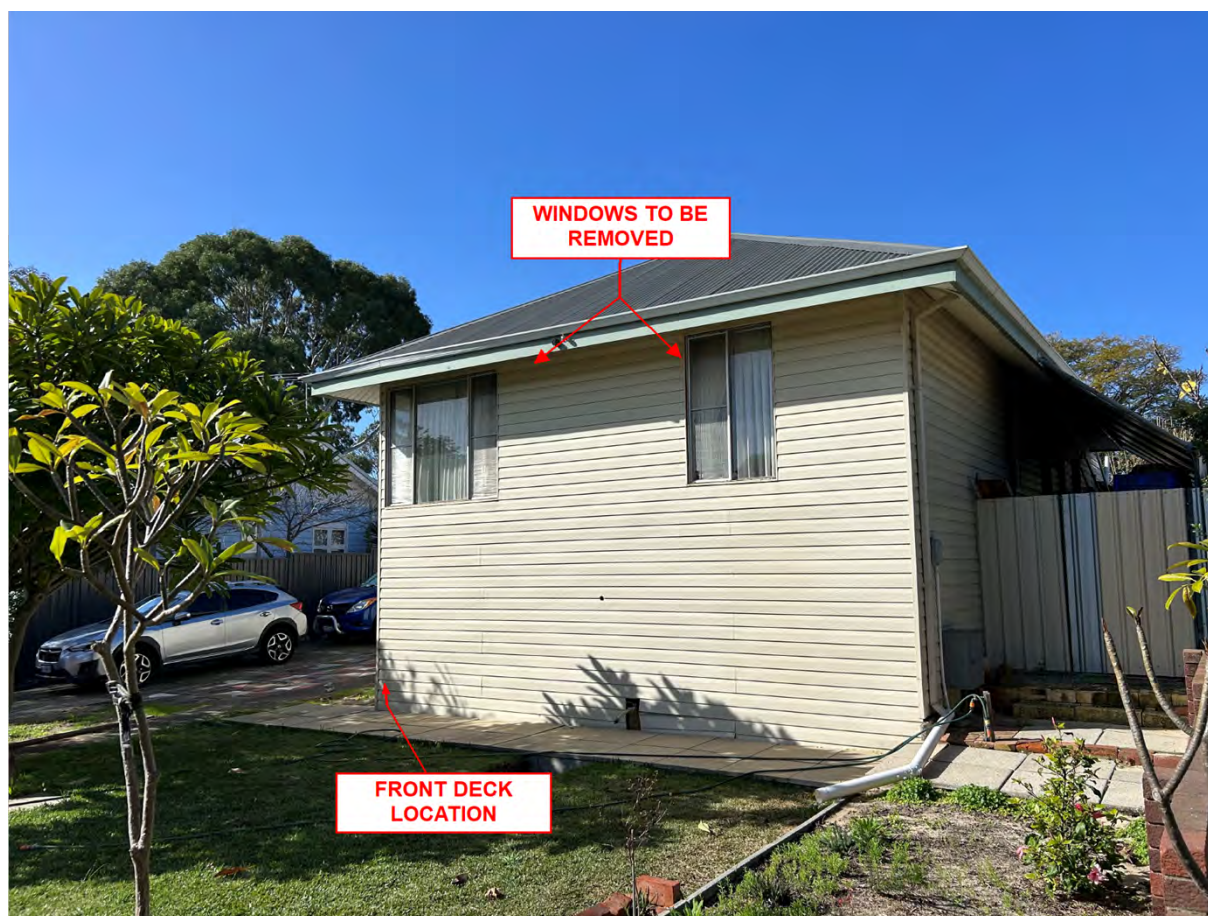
Front view of existing dwelling (view from eastern elevation)
